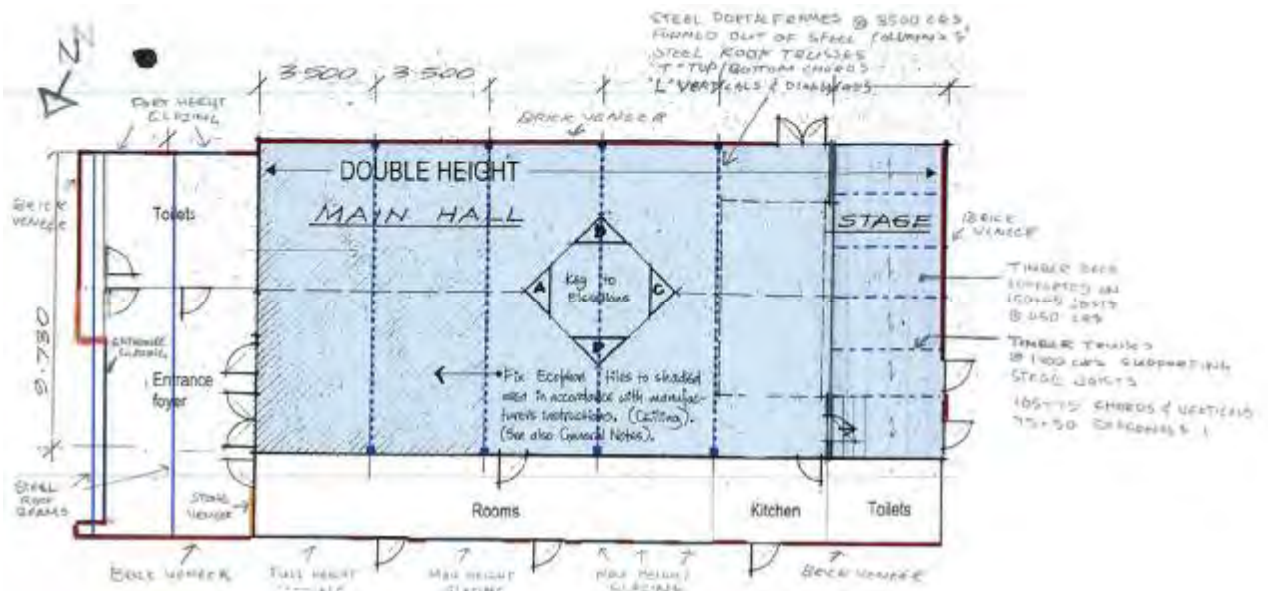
Plan of the Ngaruawahia War Memorial containing information obtained from the internal visual inspection
